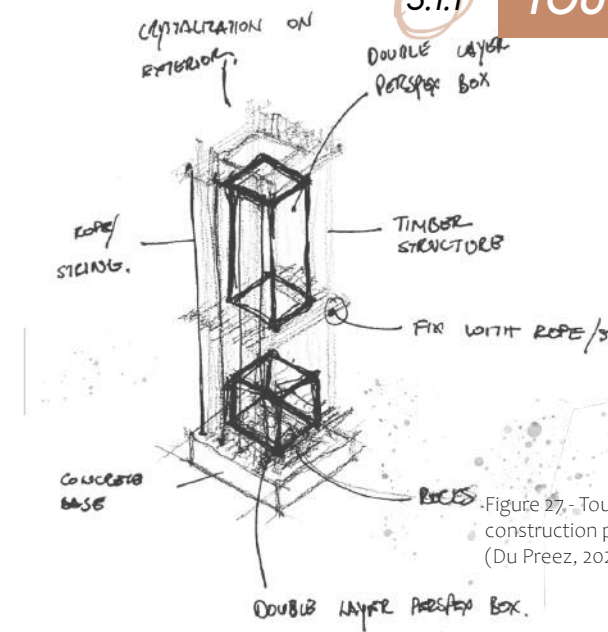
Touchstone construction planning (Du Preez, 2021).
